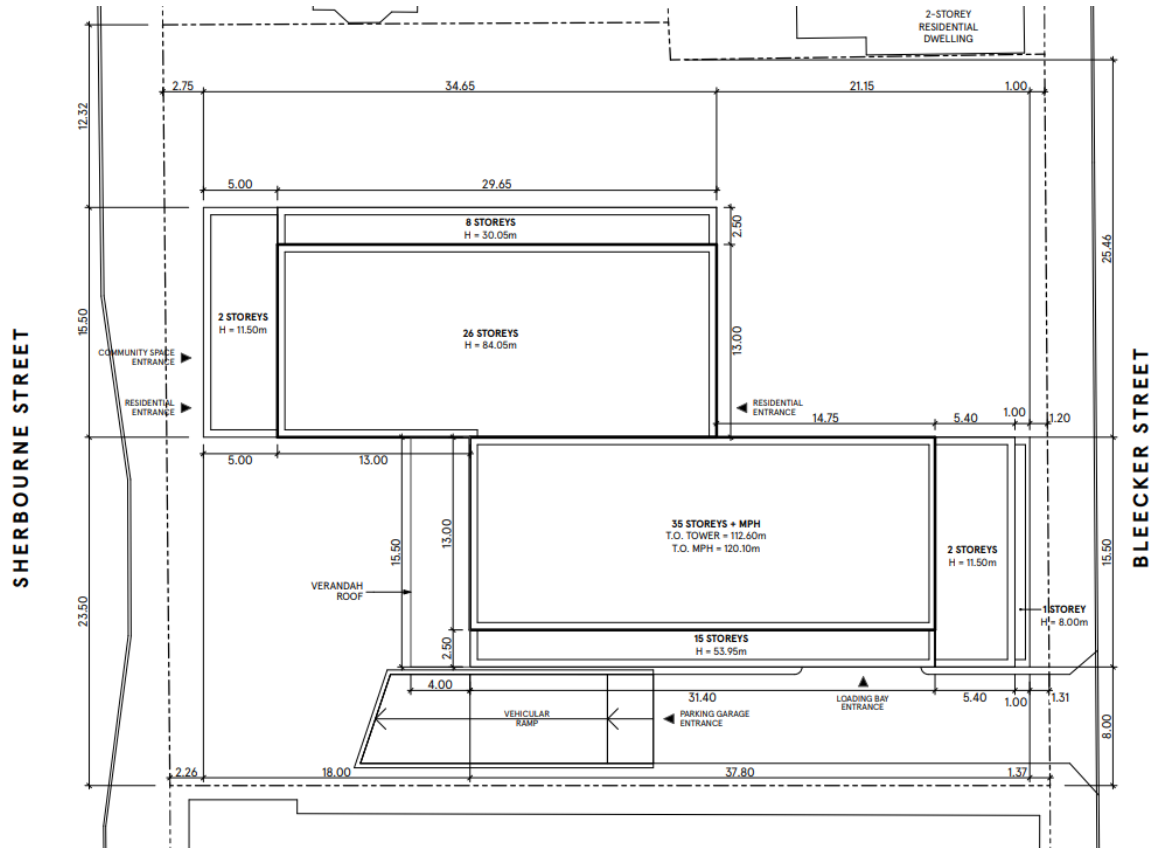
Proposed Site Plan for 405 Sherbourne Street (architects-alliance, Alison Brook Architects Inc., 2025).
